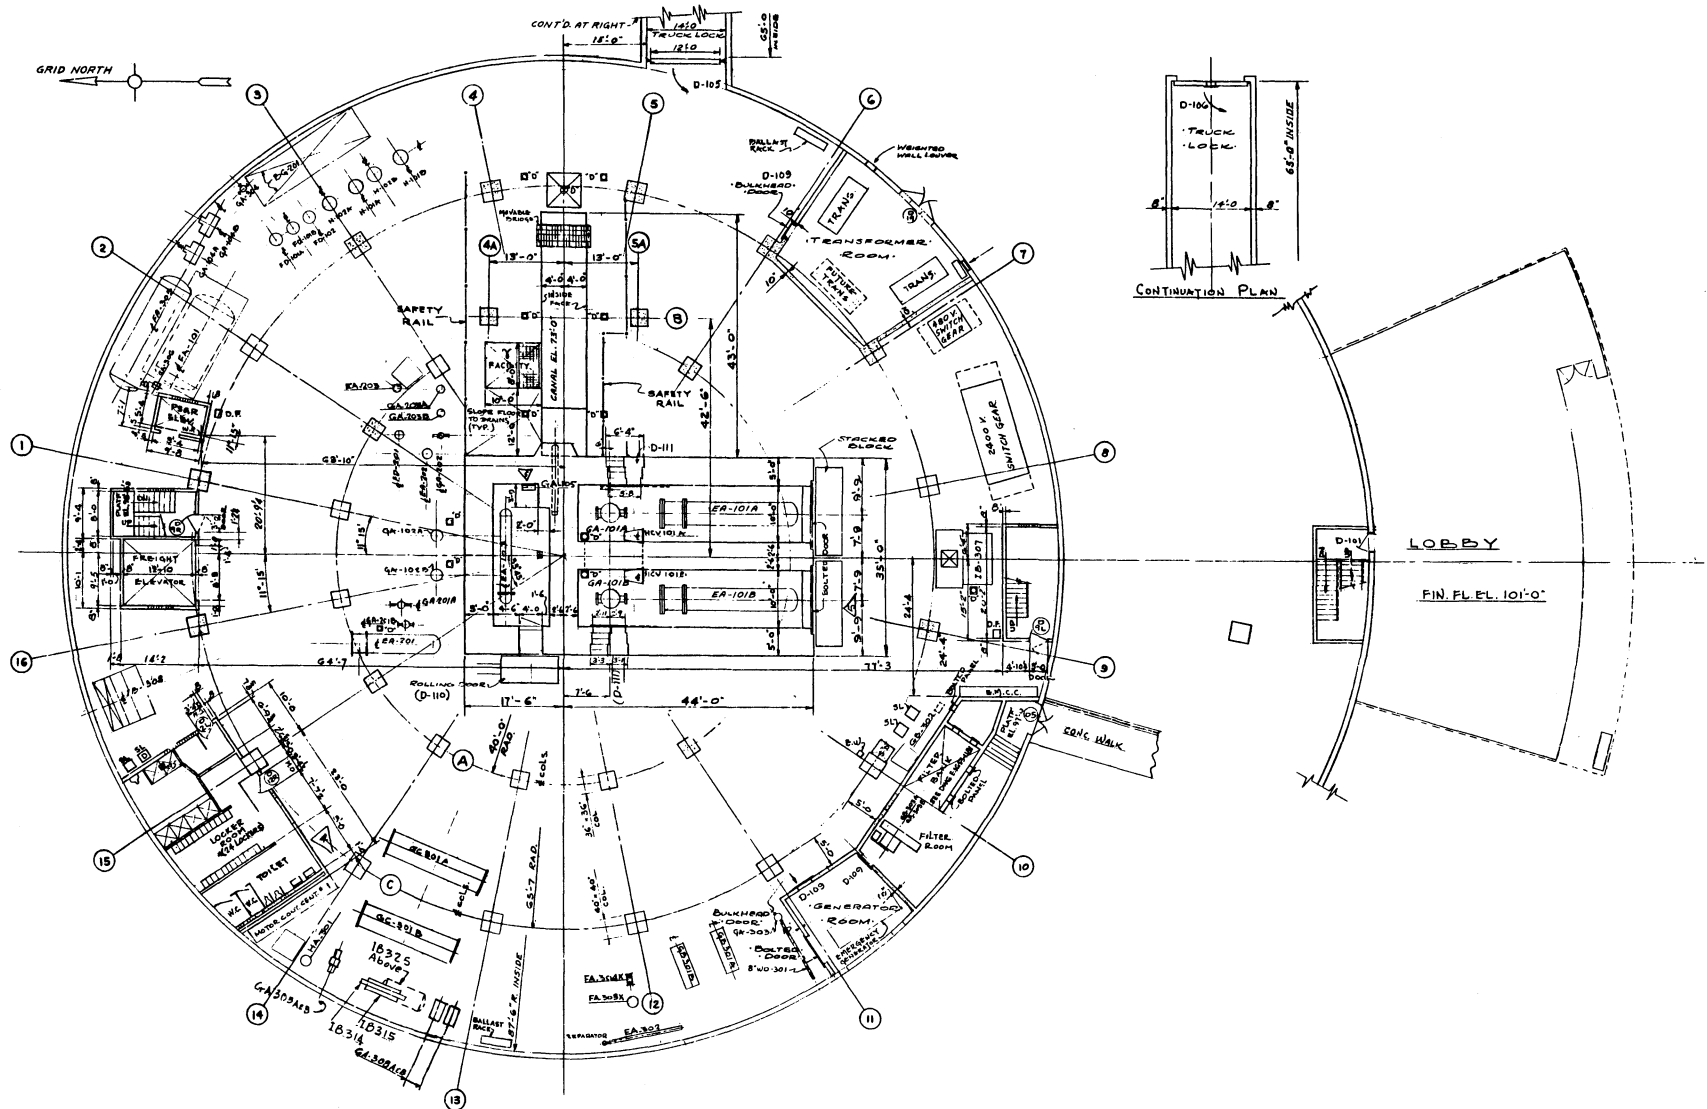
Plan of the equipment level of the HFBR building at elevation 93 ft-0 in.
